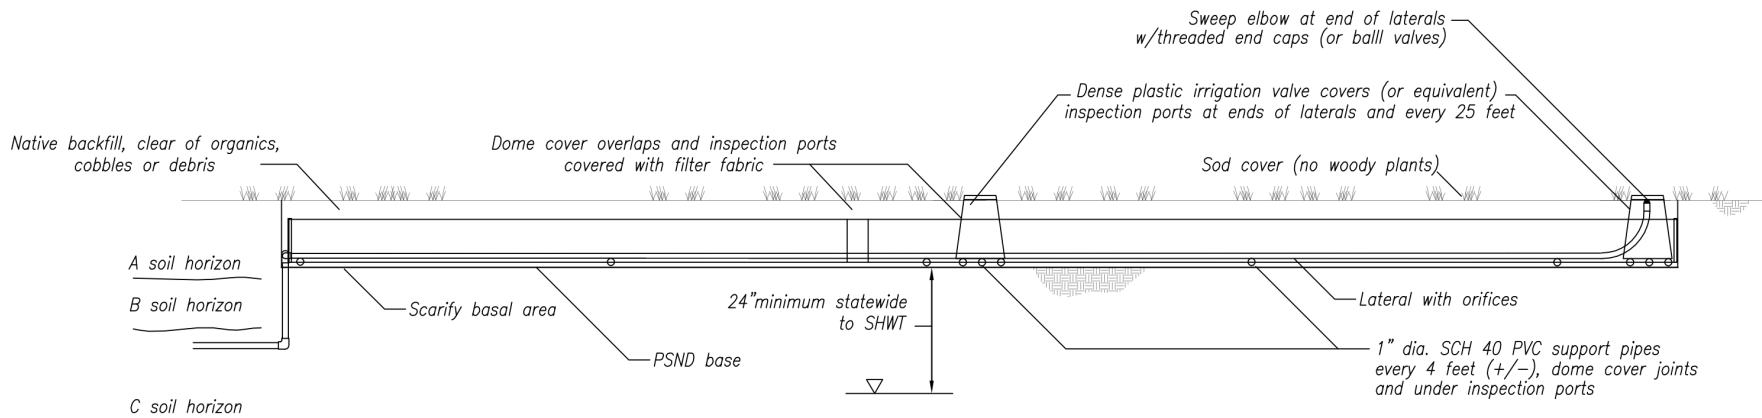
PSND CROSS SECTION DETAIL (LONG SIDE)
